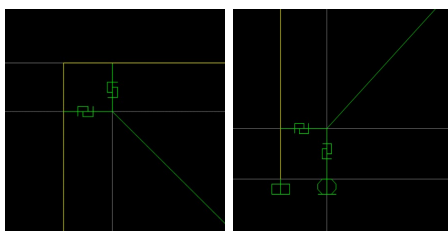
Corner detail with vertical and horizontal "link" elements simulating decoupled infill walls [14].
